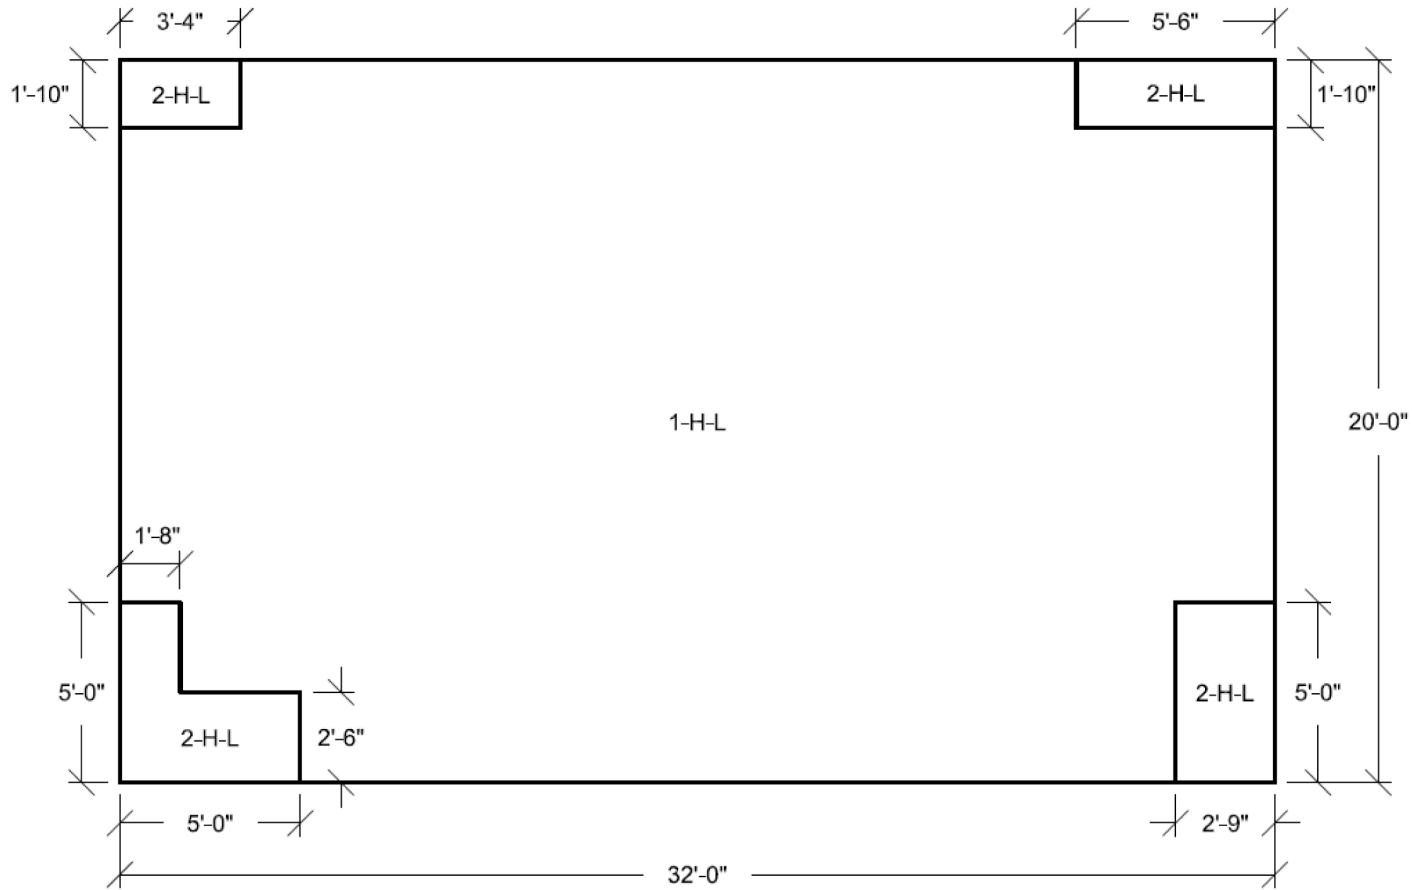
H.6-200 DGFOV Wall 15 Looking From Outside
